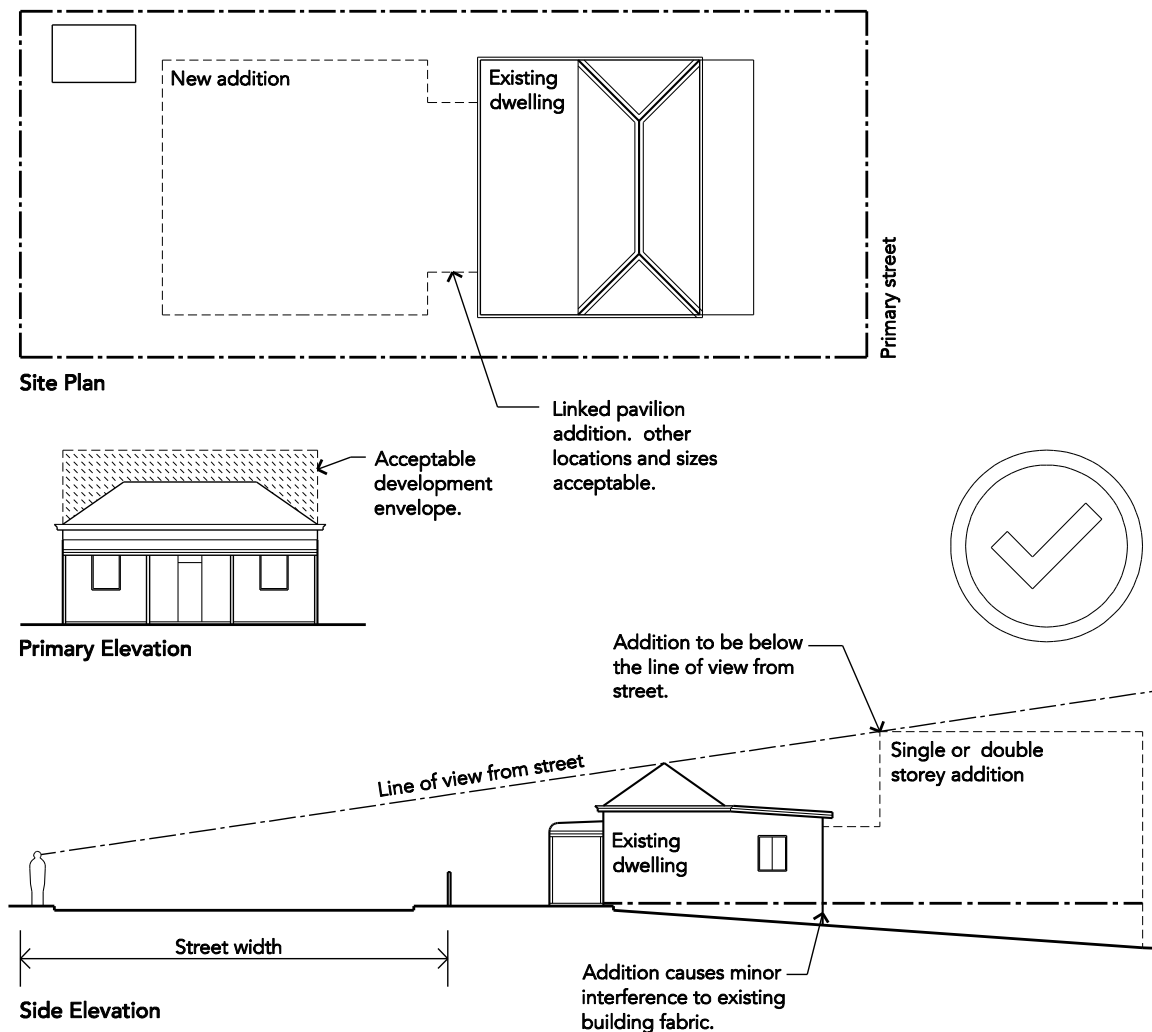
Plan and elevations illustrating compatible alterations and additions – *Griffiths Architects 2012.
